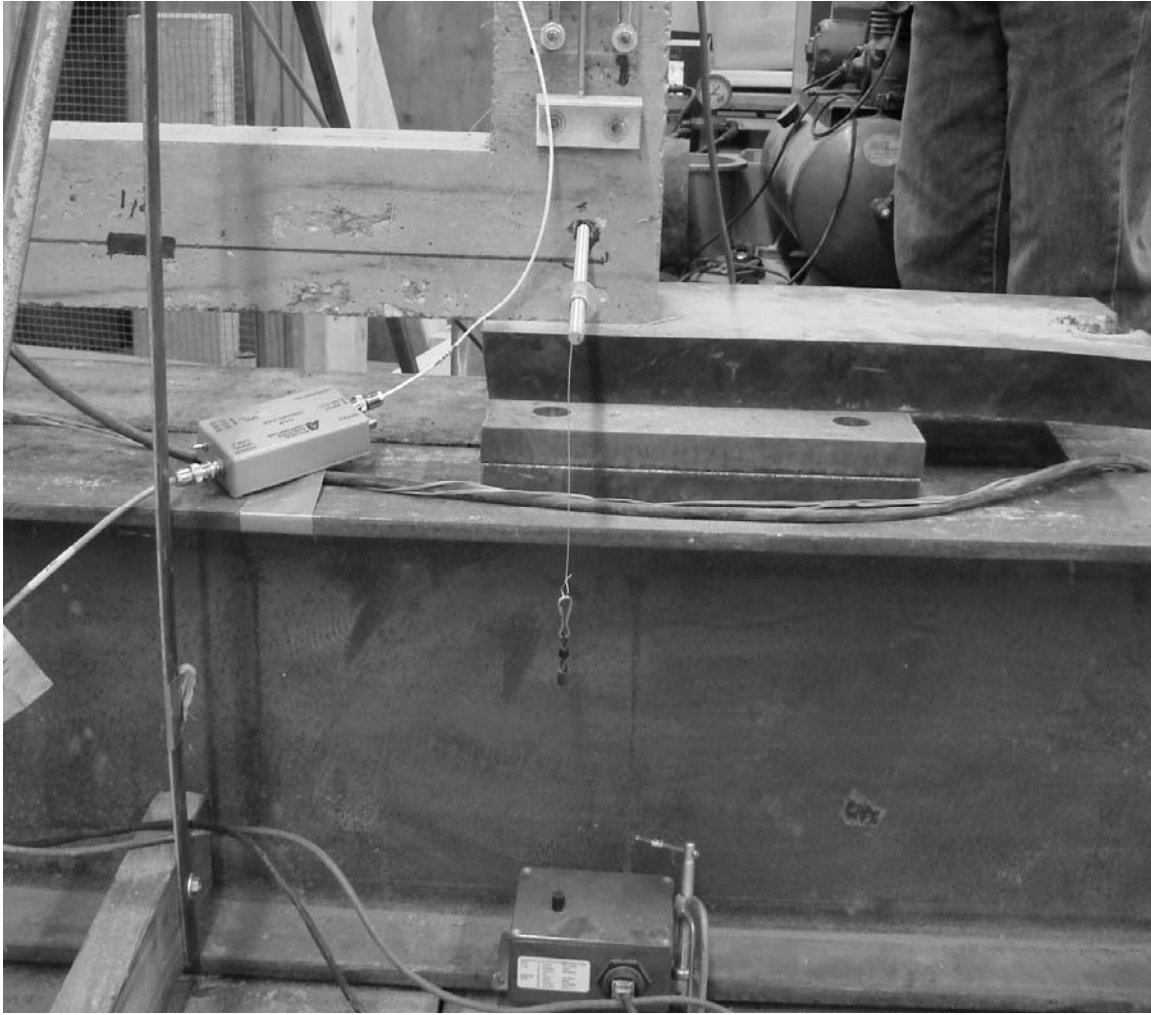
Typical support condition showing bearing pad and threaded rod attached to linear potentiometer below. The device shown on the left is the AE pre-amplifier
